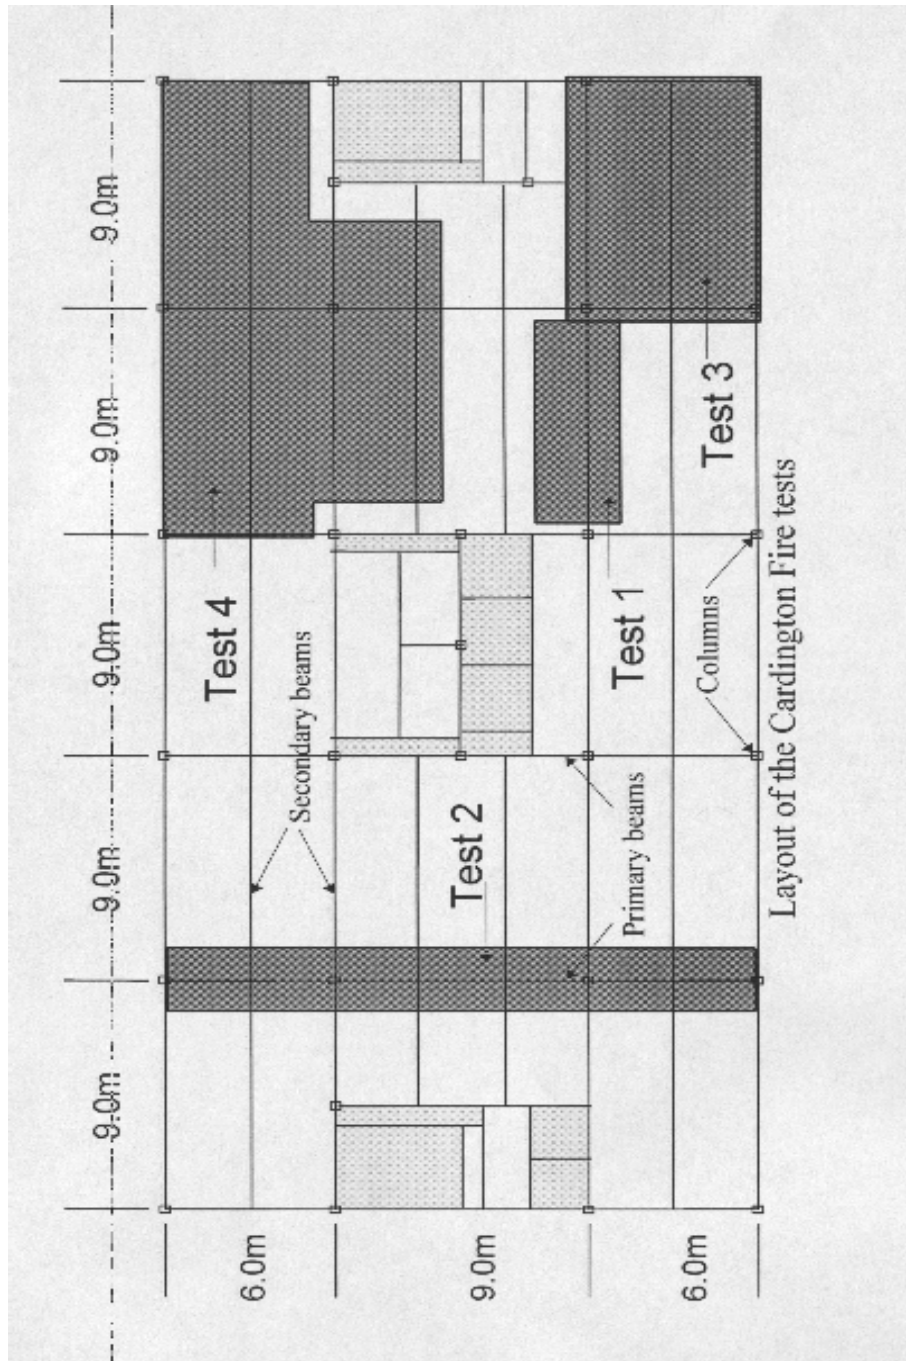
Layout of a typical floor of the Cardington frame showing the locations of the various tests. It should be noted that each test was carried out on a separate floor.
